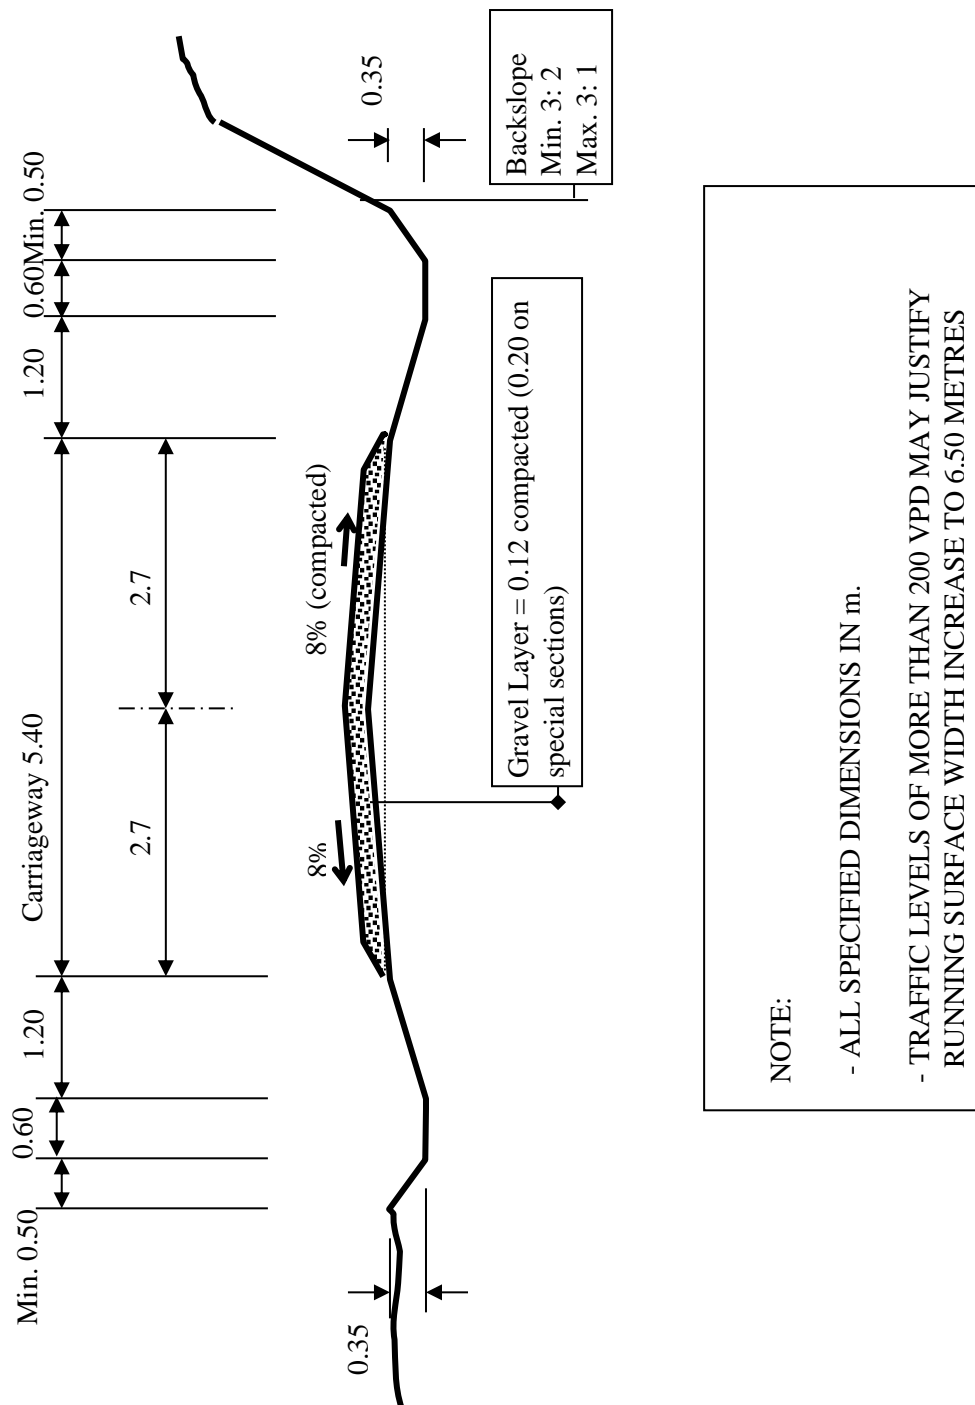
CROSS SECTION B (REDUCED CROSS-SECTION)
